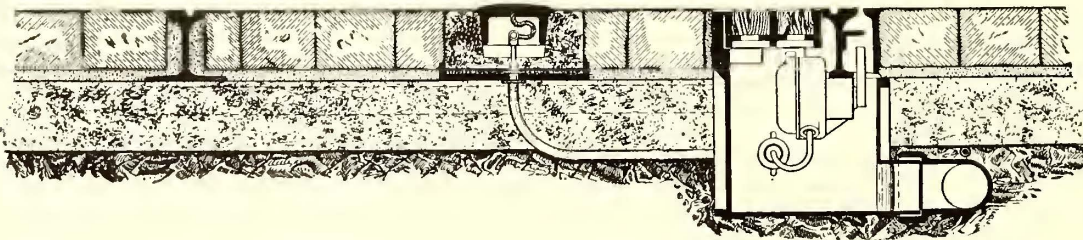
SECTION OF TRACK, CONDUIT AND STUD
